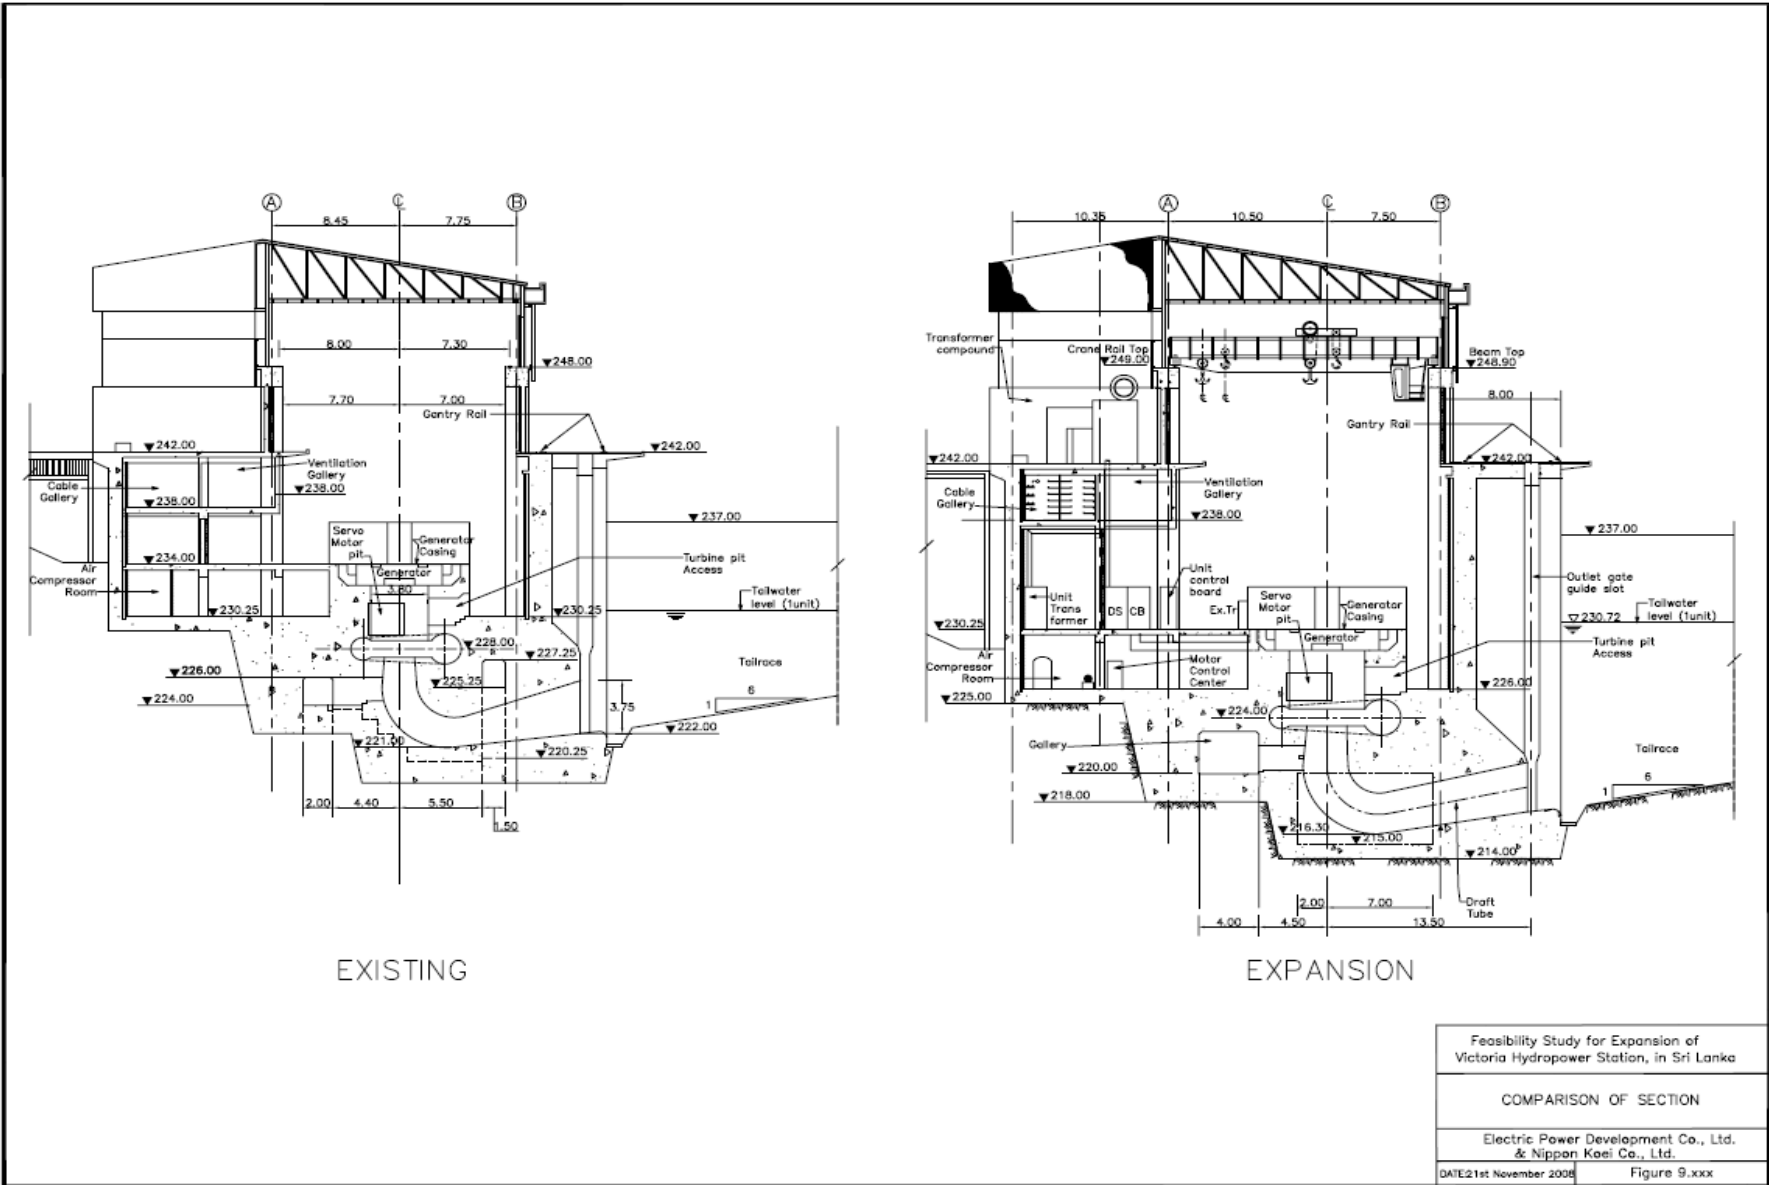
Profile of the Existing and Expansion Powerhouse
